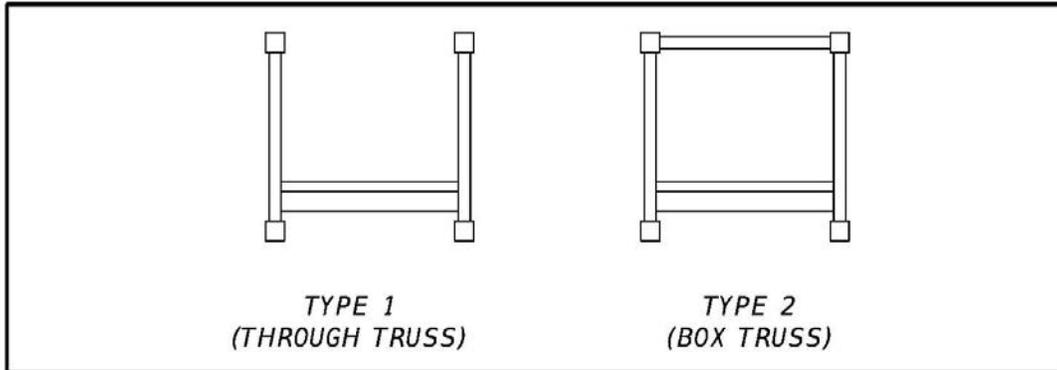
Prefabricated Pedestrian Standard Bridge Cross-Sections
